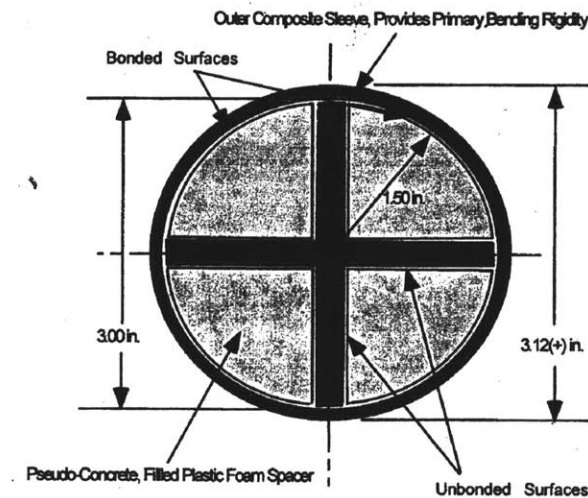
Cross-section of an hysteretic damper proposed by KCI.
